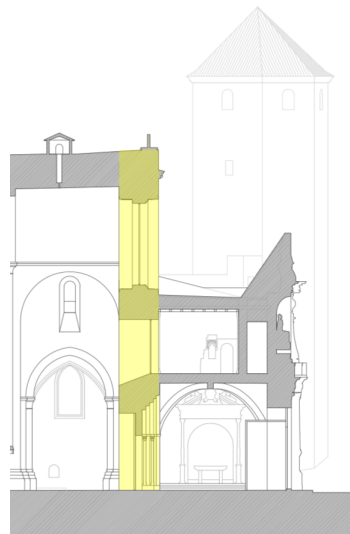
South-facing longitudinal section of Poblet showing original facade (highlighted) with galilee and new facade in front
